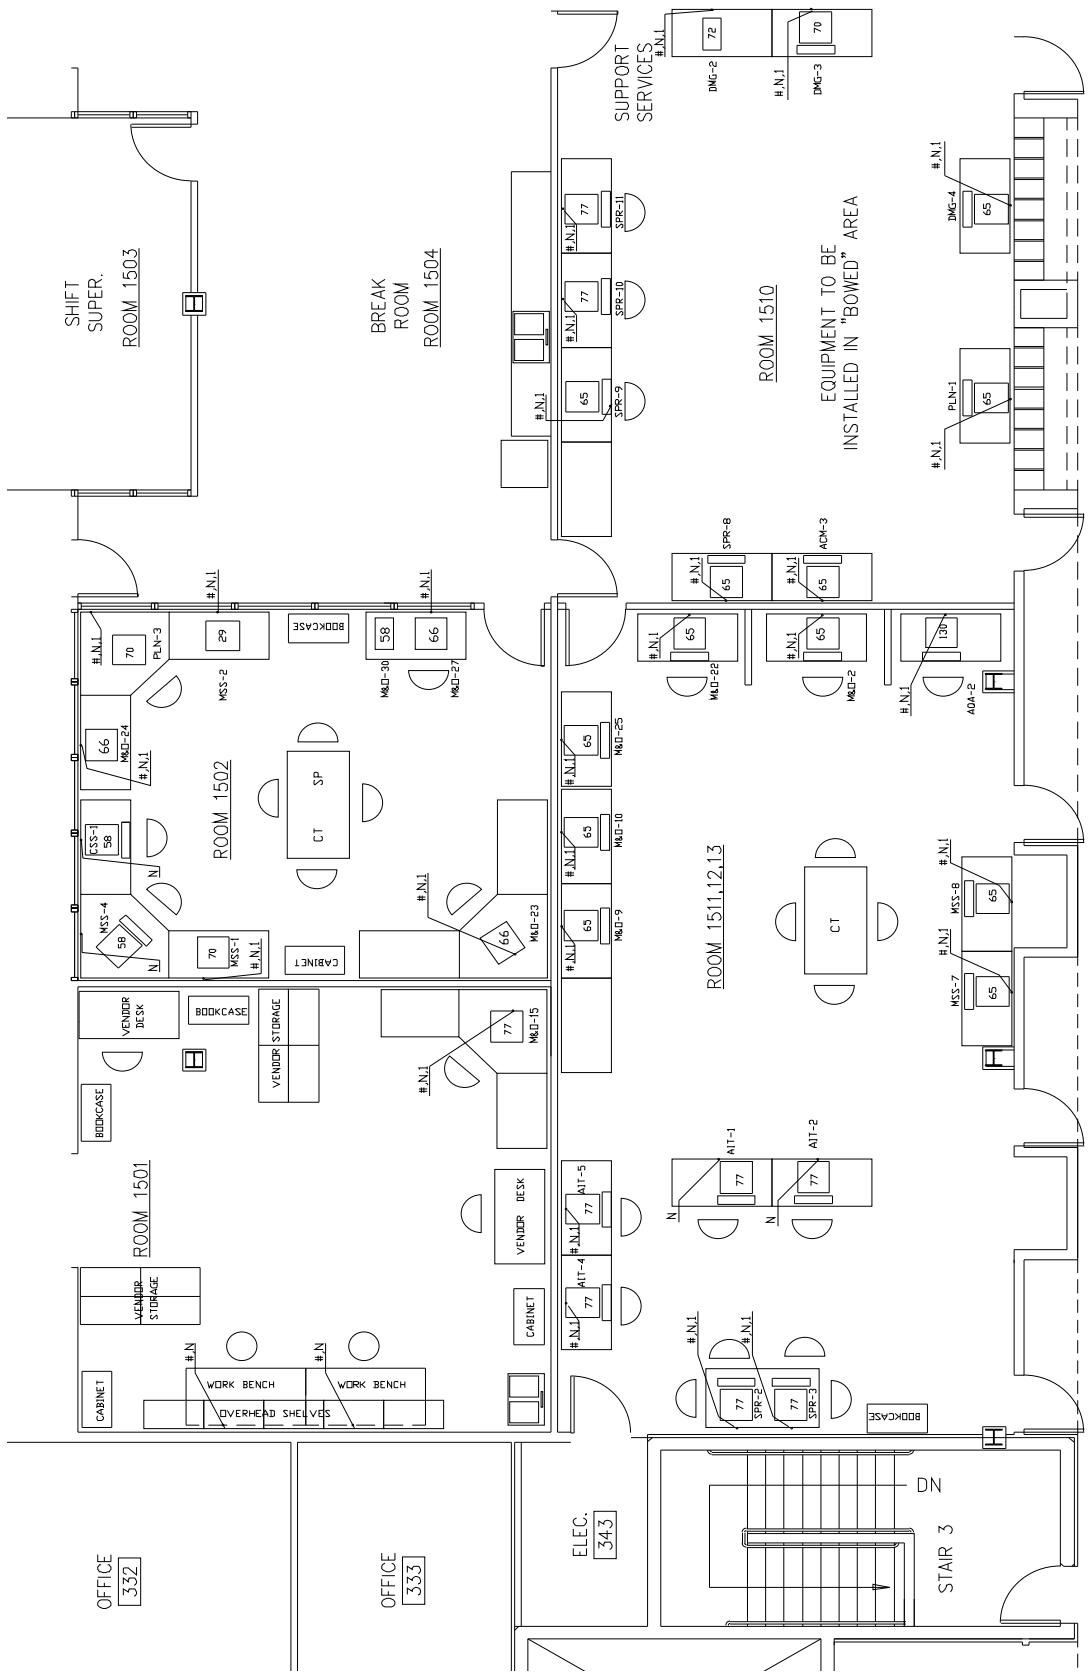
EDC Release B First Procurement Floor Plan --Room 1500 Offices
